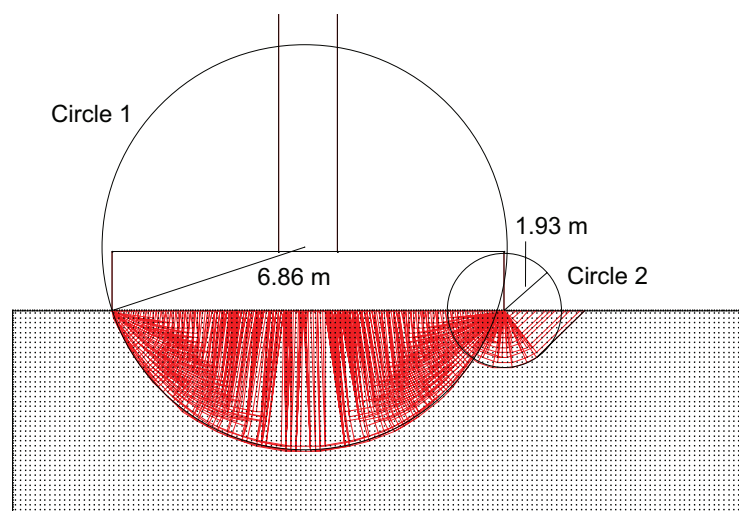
Geometry of failure beneath the surface footing.
